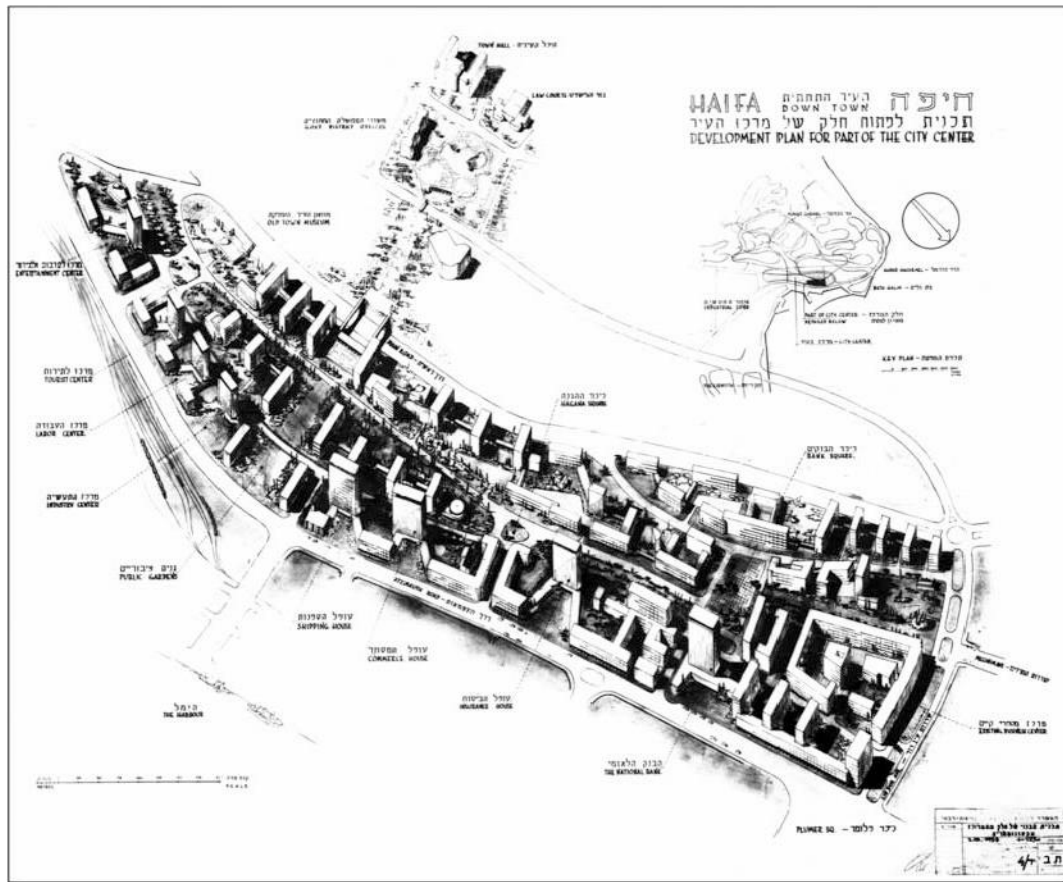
A Plan for The Development of Haifa's Downtown, 1953 (unbuilt)
